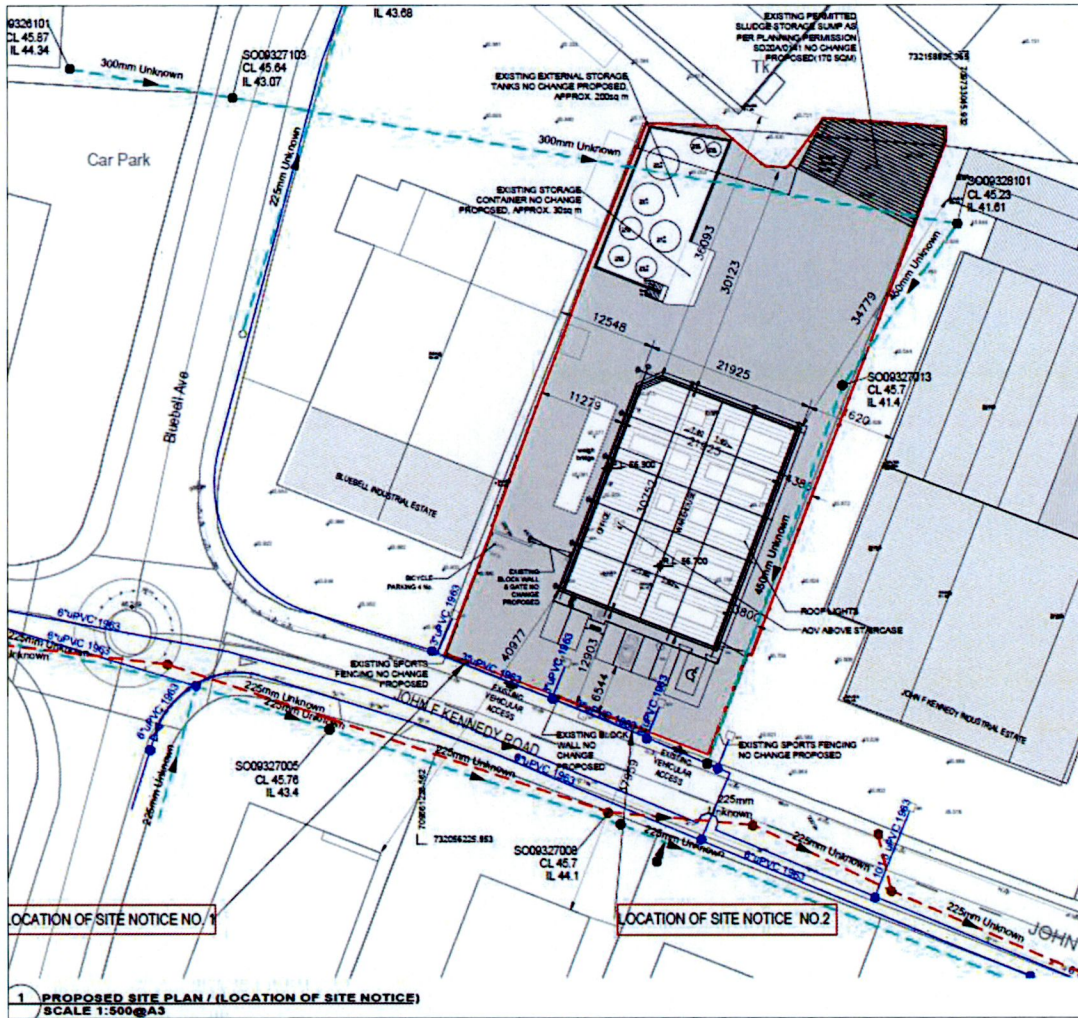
Proposed Site Plan (Drawing No.: B0125-A-003)
